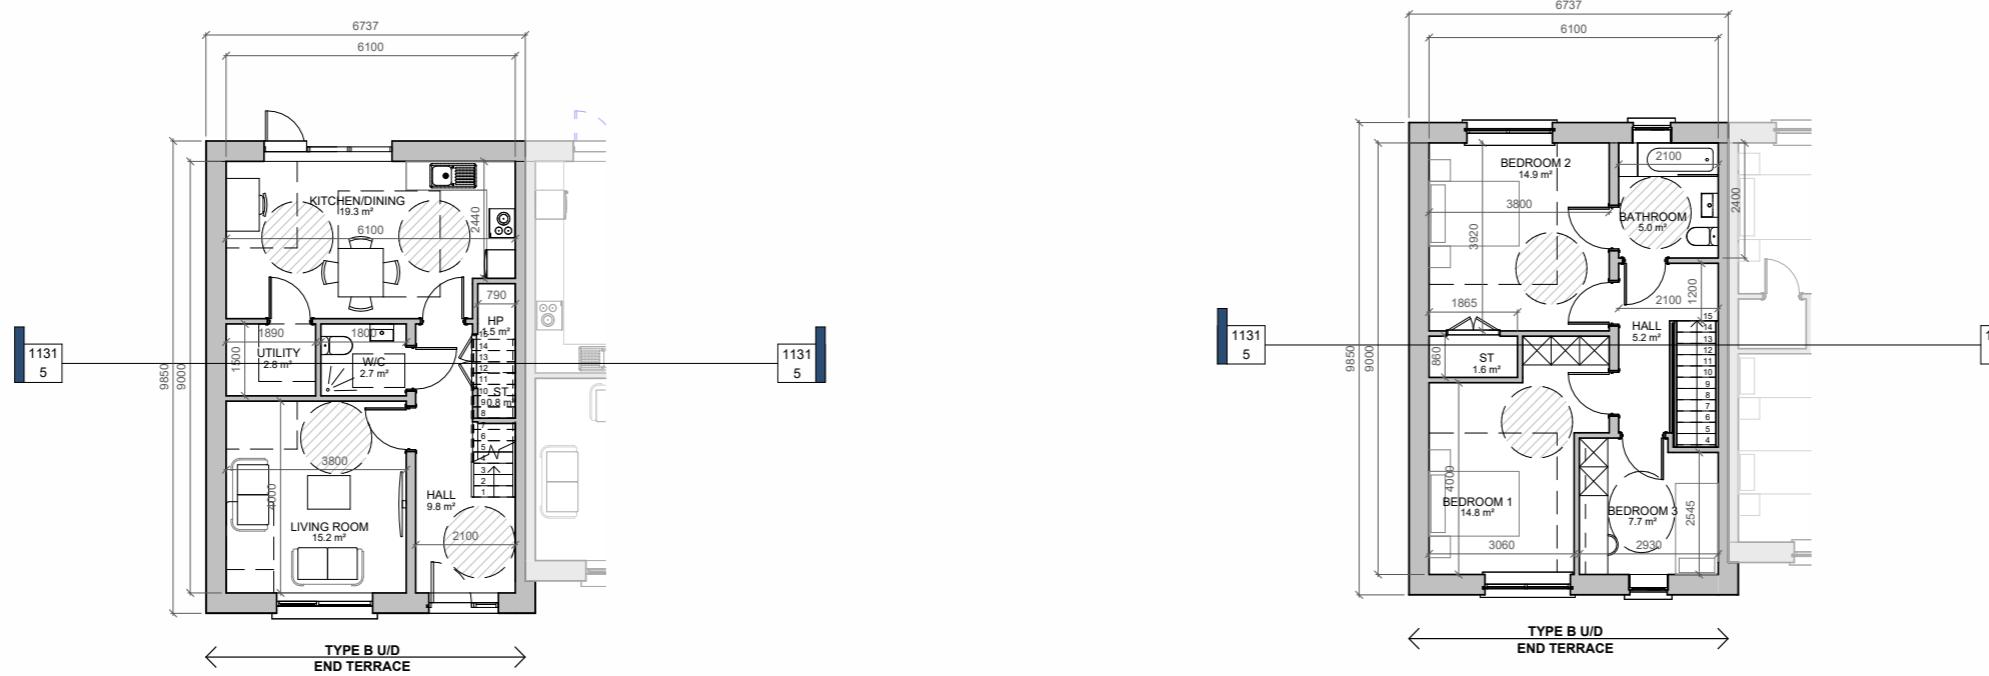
House Type H-3B5P-4; 3-bedroom UD House, ground and first floor
